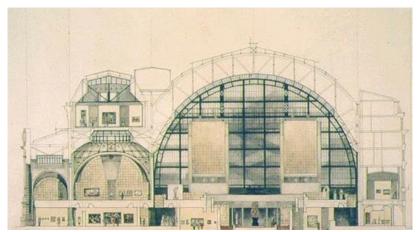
Building Cross-Section. Project by Gae Aulenti - Photo musée d'Orsay
